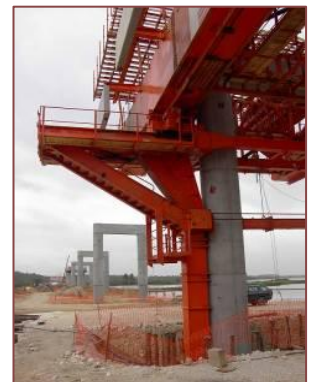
Underslung MSS – pier supports for pile-piers and double T deck
